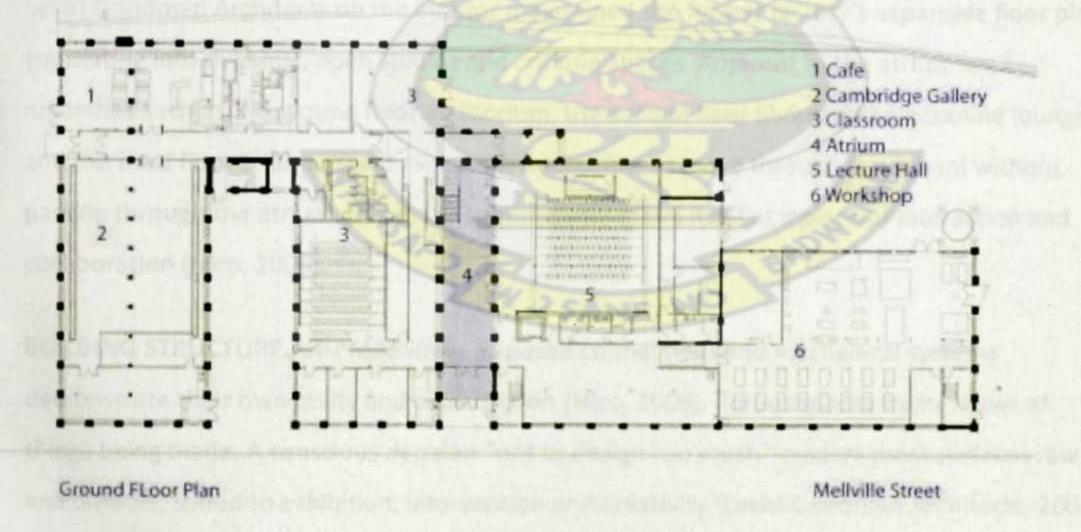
, Ground floor plan of Waterloo School of Architecture (Levitt Goodman Architects, 2009)
